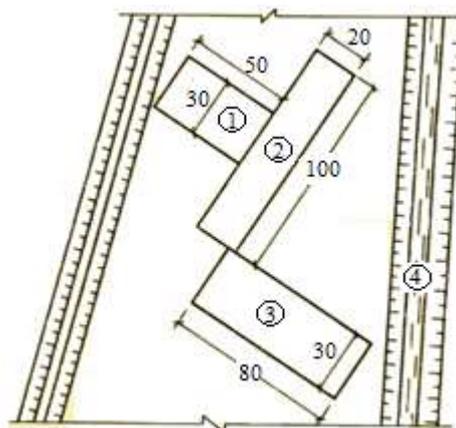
Site plan construction: 1, 2, 3 – sealing areas; 4 - water conveyance channel
